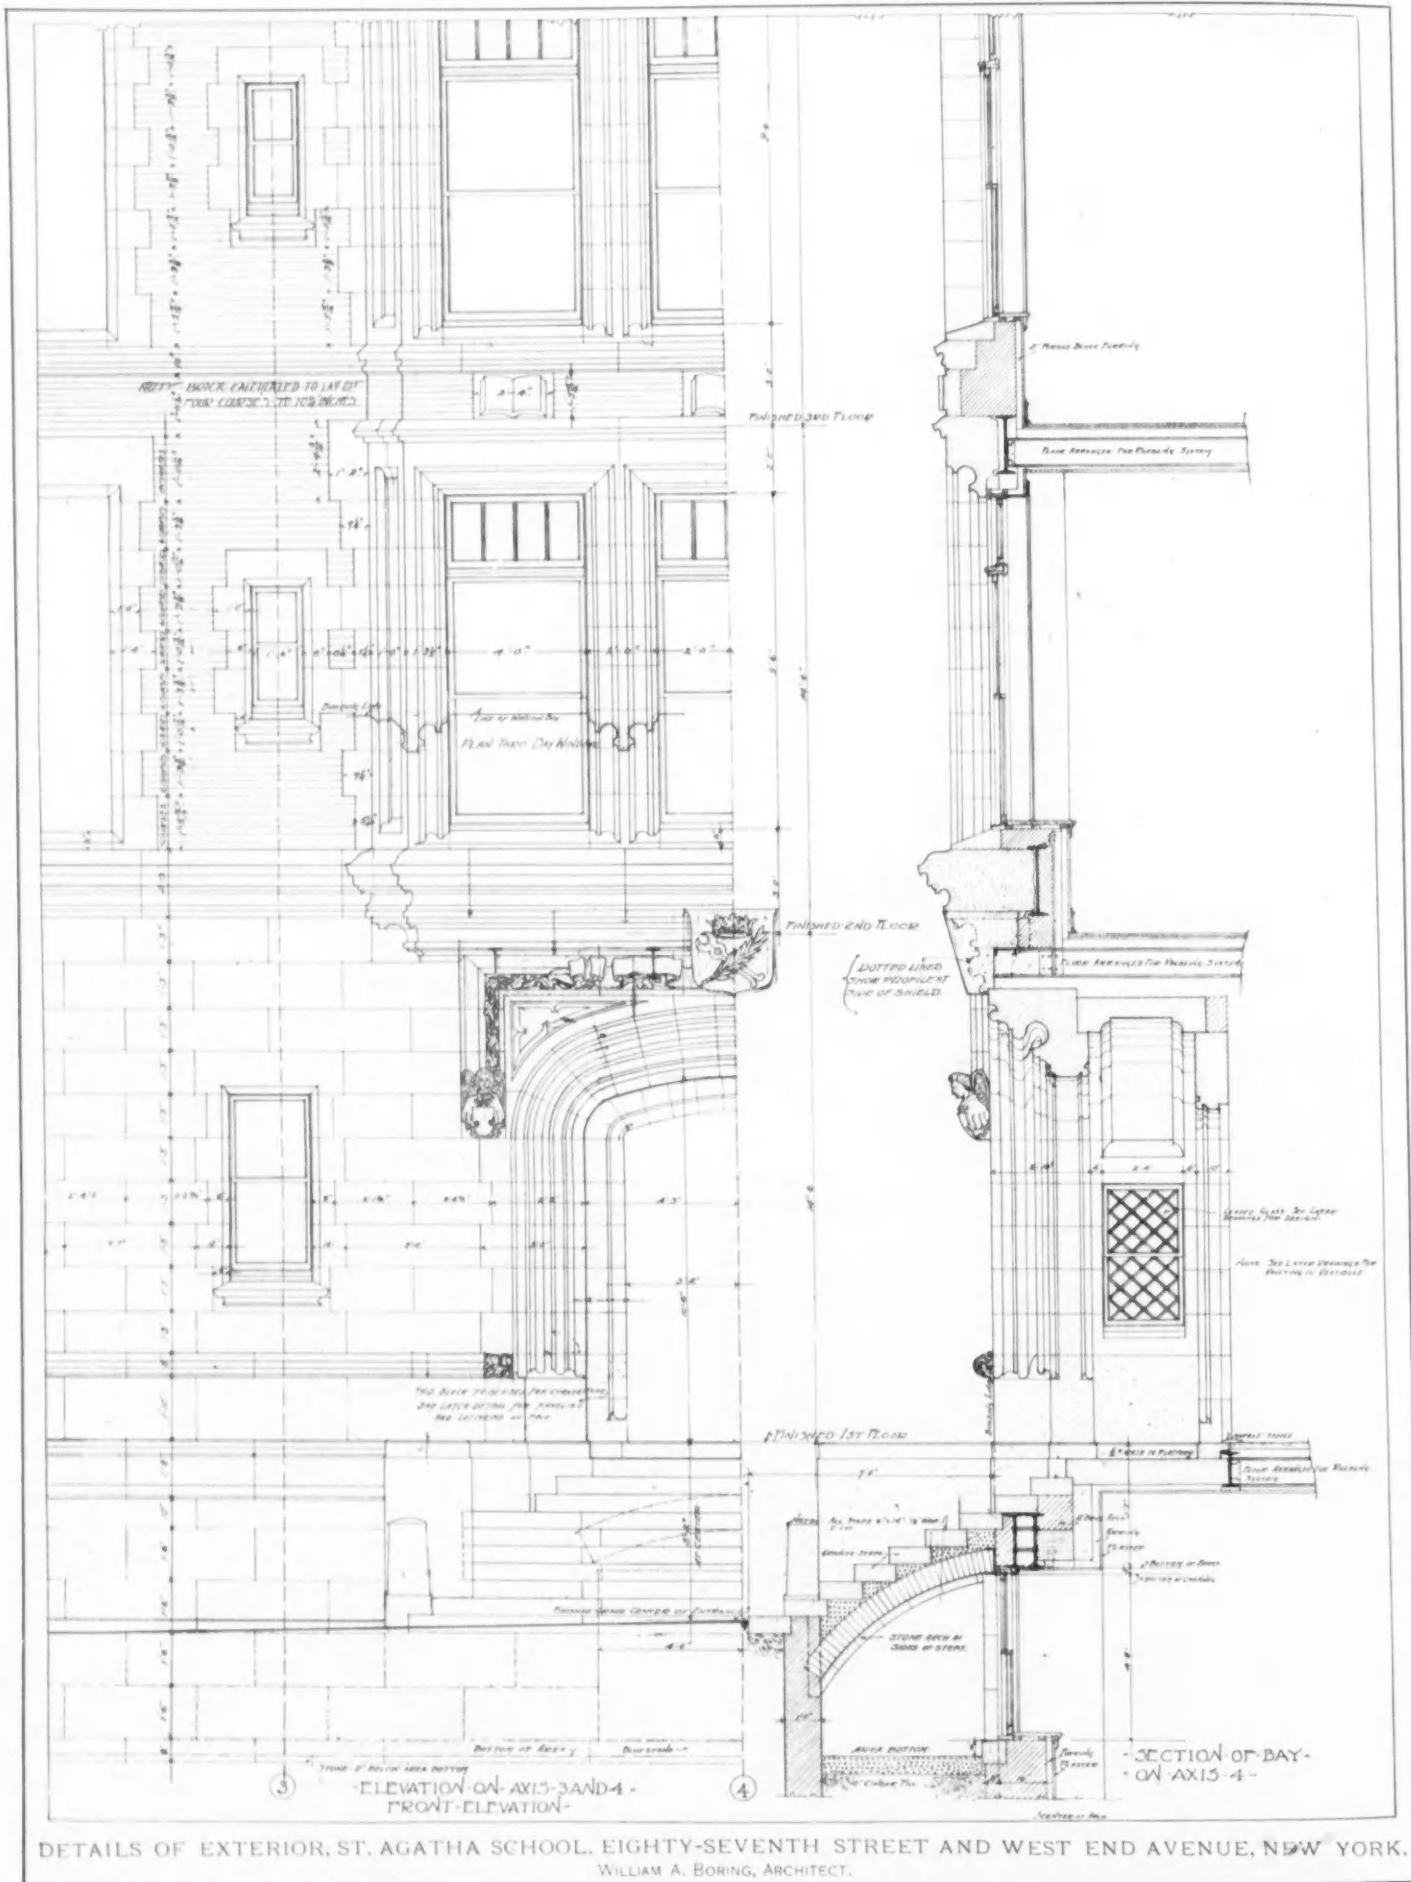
DETAILS OF EXTERIOR ST. AGATHA SCHOOL, EIGHTY-SEVENTH STREET AND WEST END AVENUE, NEW YORK.
